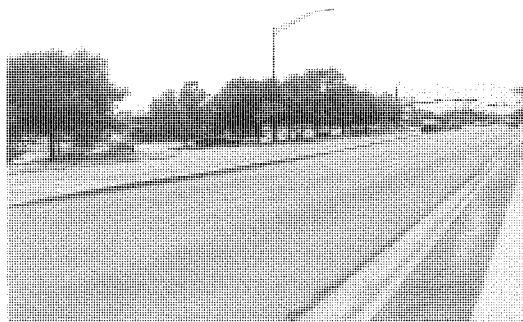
Nontraversable median installed circa 2009 on Southwest Parkway at Texas Avenue, College Station, Texas, as a retrofit action to restrict left turns at a driveway serving a strip commercial center.
